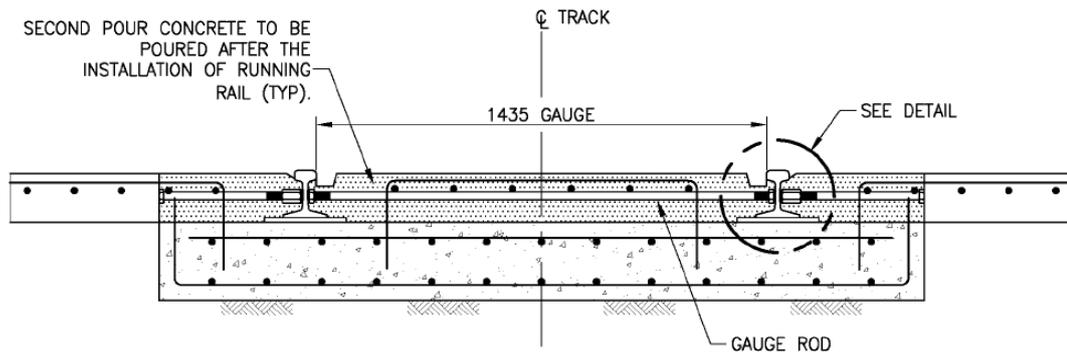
Cross-section of direct fixation trackway at street crossing
